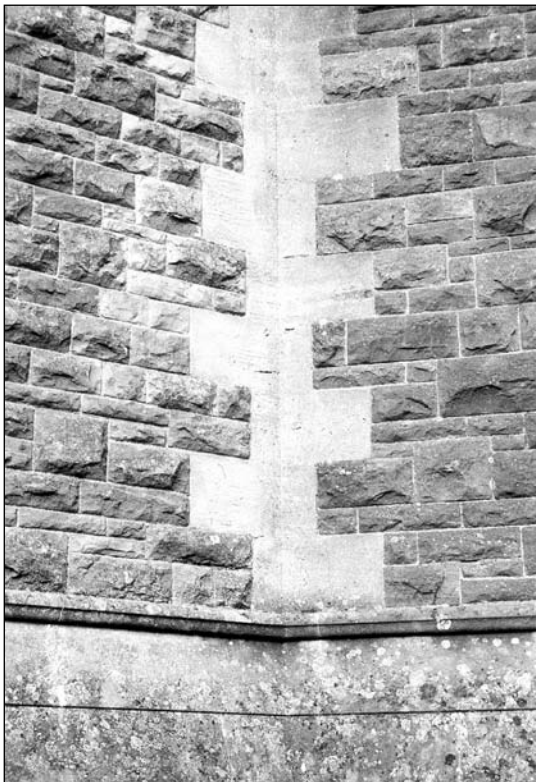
Masonry of Swindon stone and Bathstone dressings, junction of south wall of tower and south-east tower buttress
